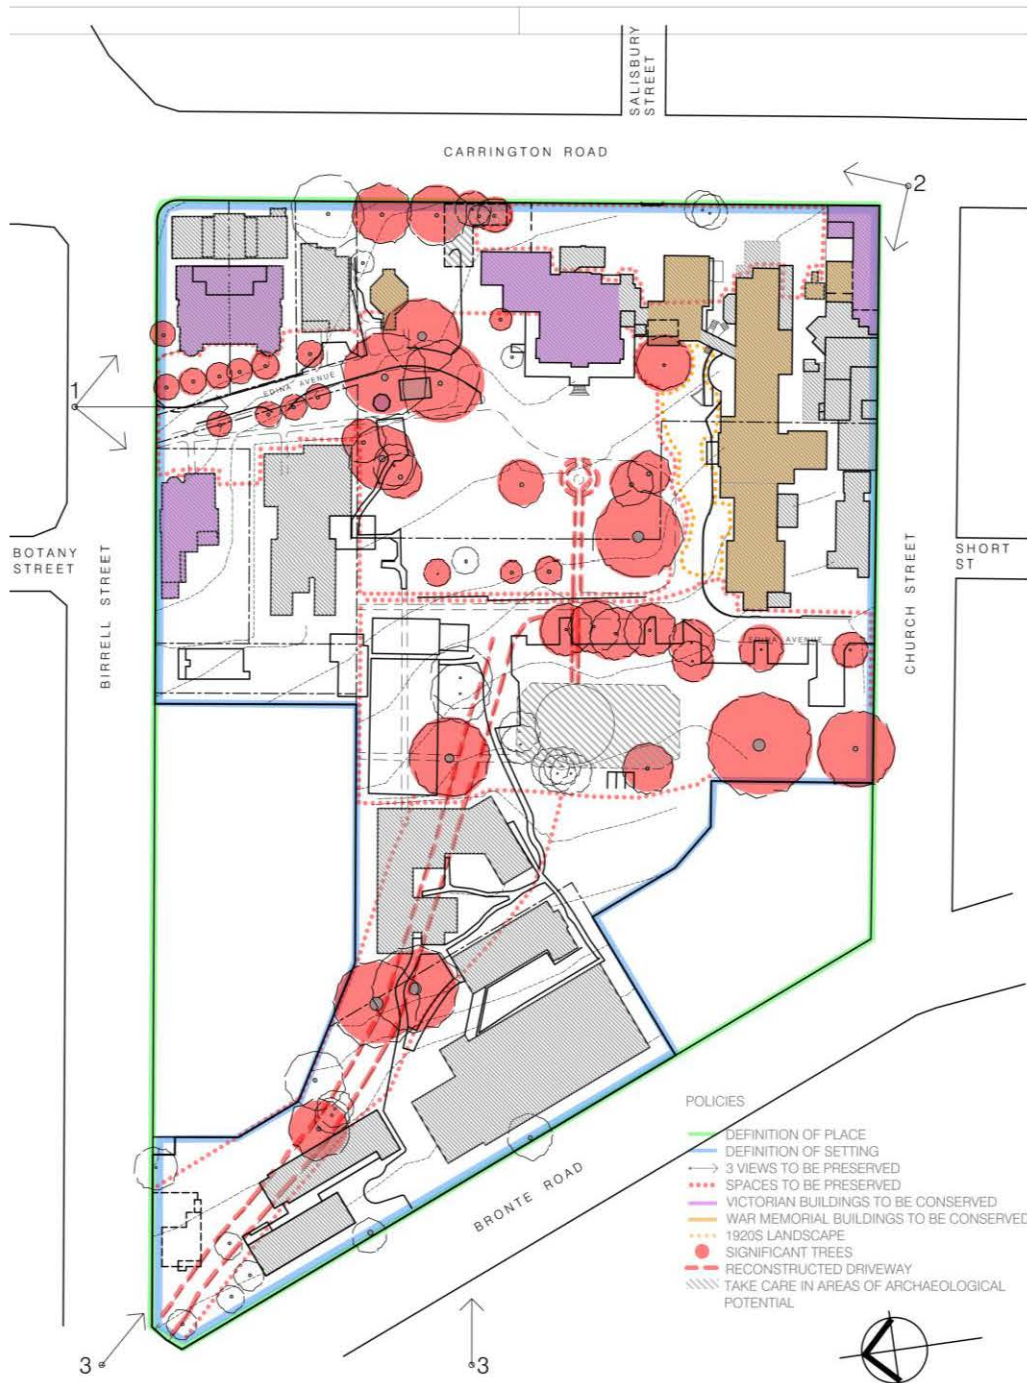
Site plan illustrating conservation policies. (Source: Hector Abrahams Architects)
